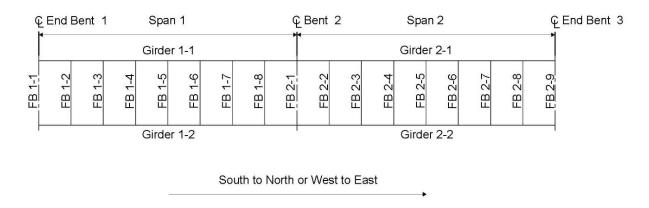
Girder and Floor Beam Plan View Labeling Convention
